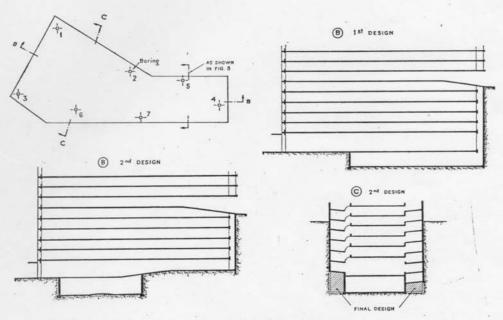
Subsoil section and cross-sections of sub-structure as modified in successive steps Coupe du sous-sol et coupes des fondations selon les modifications successives
